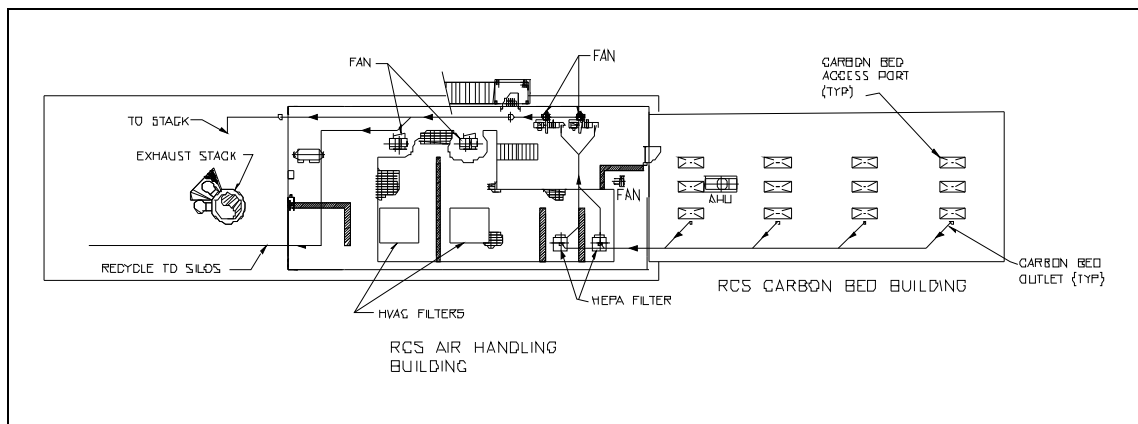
Radon Control System Air Flow Pattern – 2nd Floor Plan
